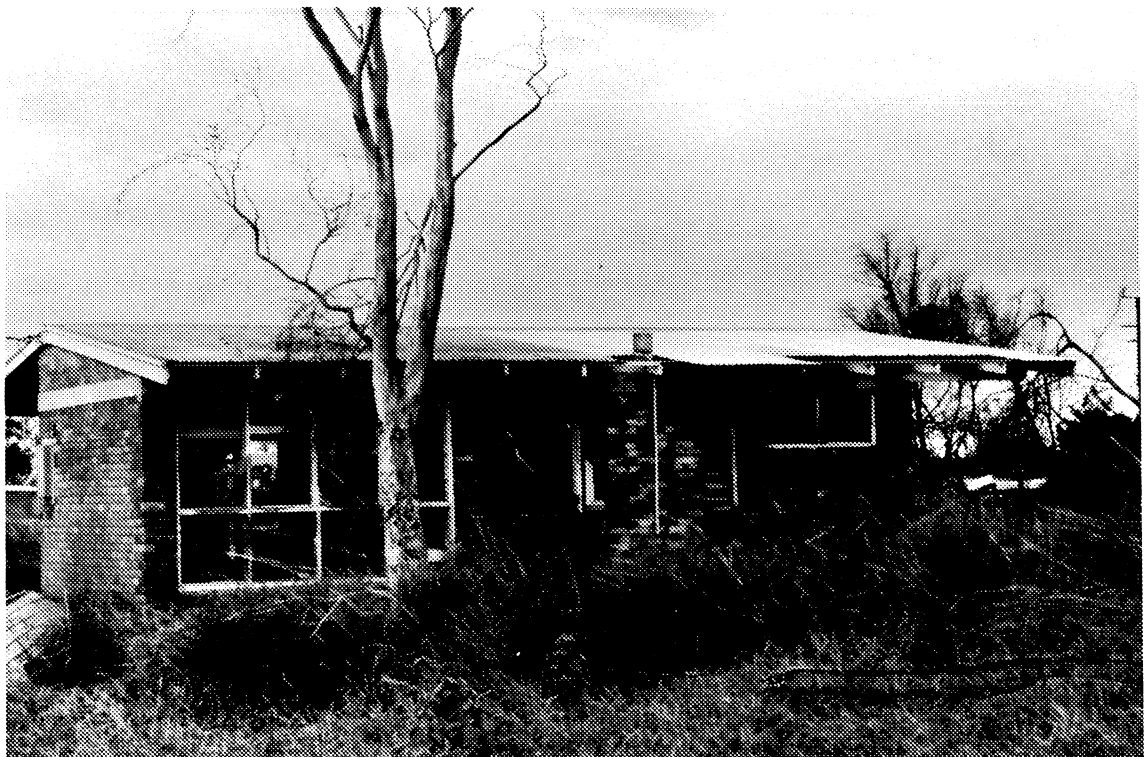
This masonry aboriginal housing lost some roof sheeting but could be quickly repaired.
